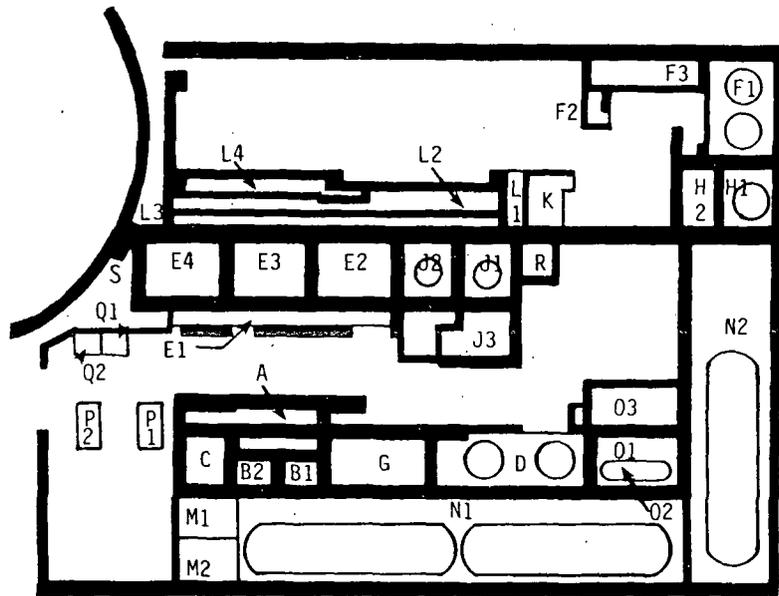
Auxiliary and Fuel Handling Buildings, 281-Foot Elevation.
